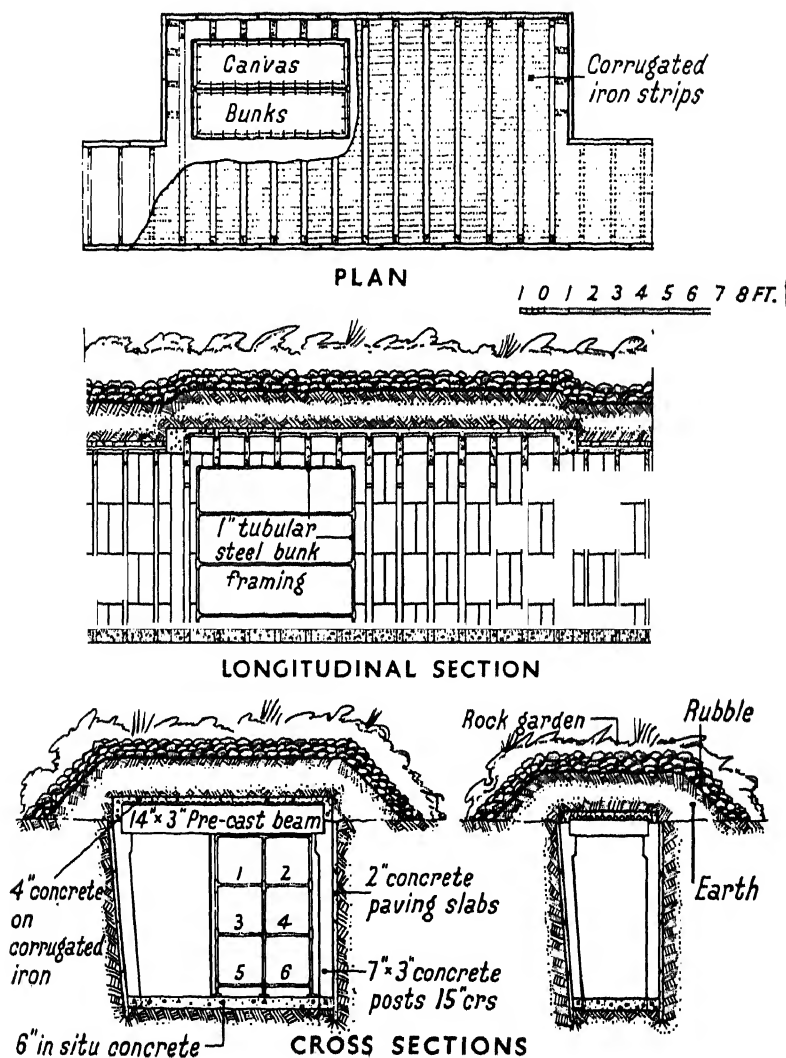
Bunks in recess in trench system, showing use of pre-cast reinforced concrete units in construction of revetment and cover.
